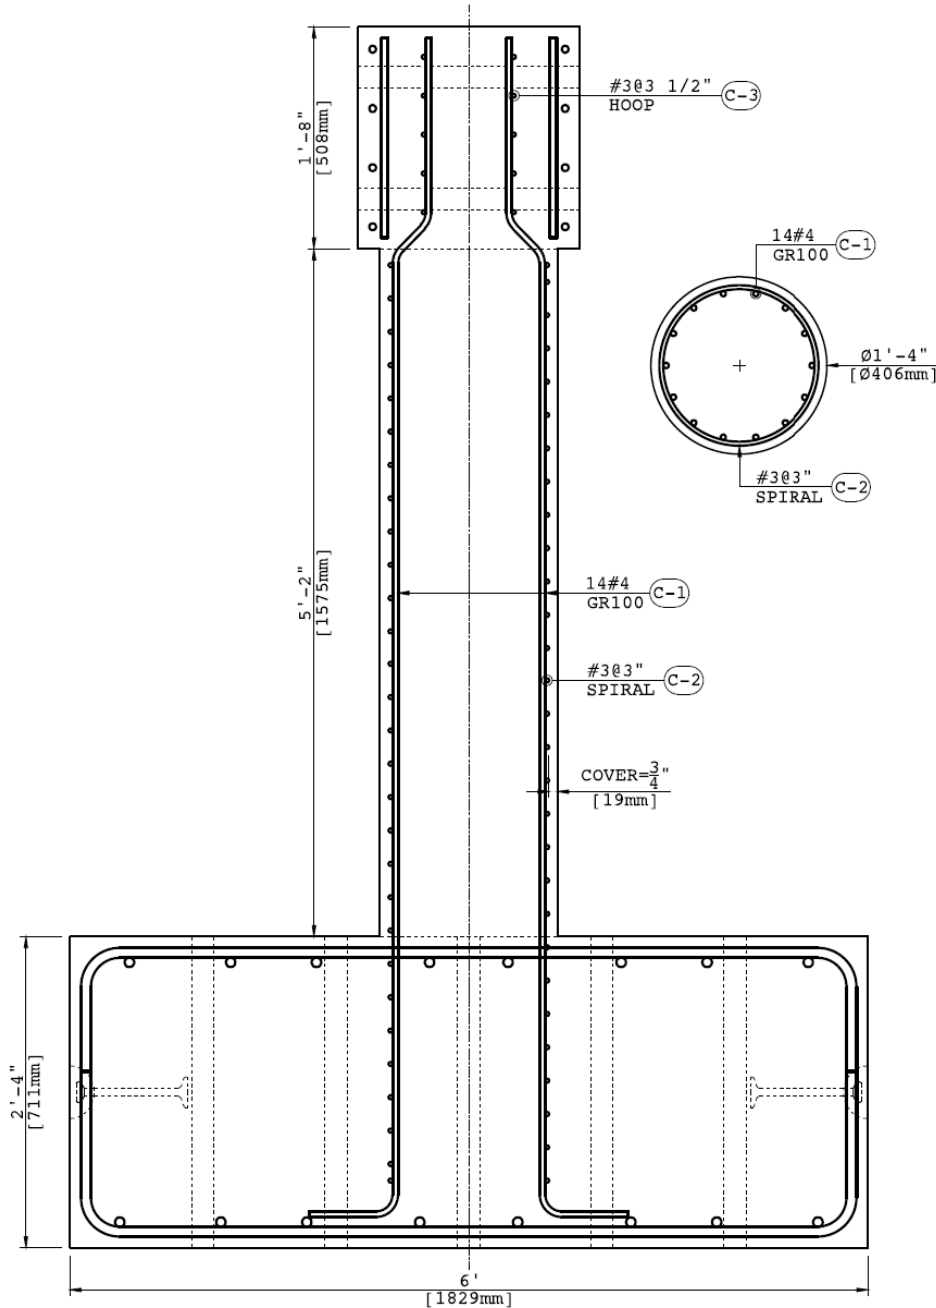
Columns SD-S3-G100 and LD-S3-G100: reinforcement details.
